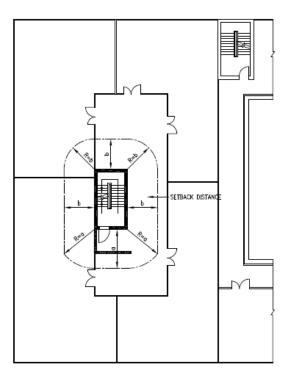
A - Plan - Staircase Storey Shelter With Setback Distances
